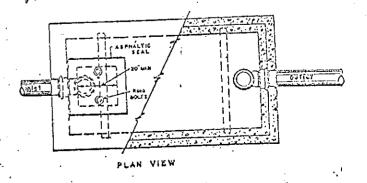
TYPICAL CONCRETE SEPTIC TANK
